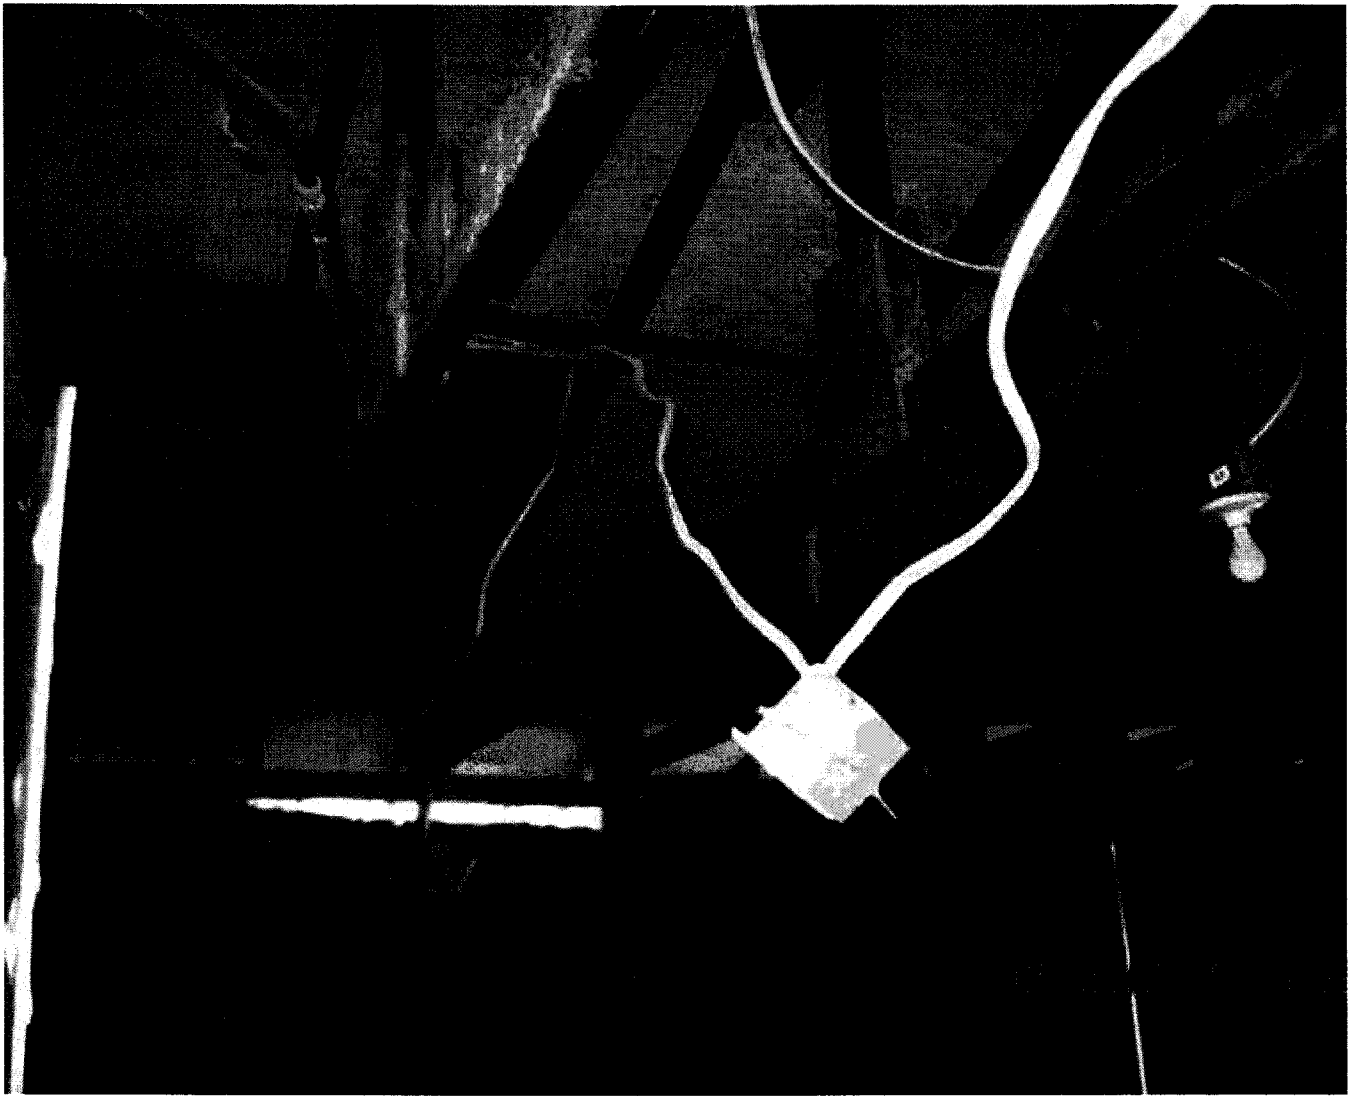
Defect 6 RW_ substandard electrical. - 05/04/2010
